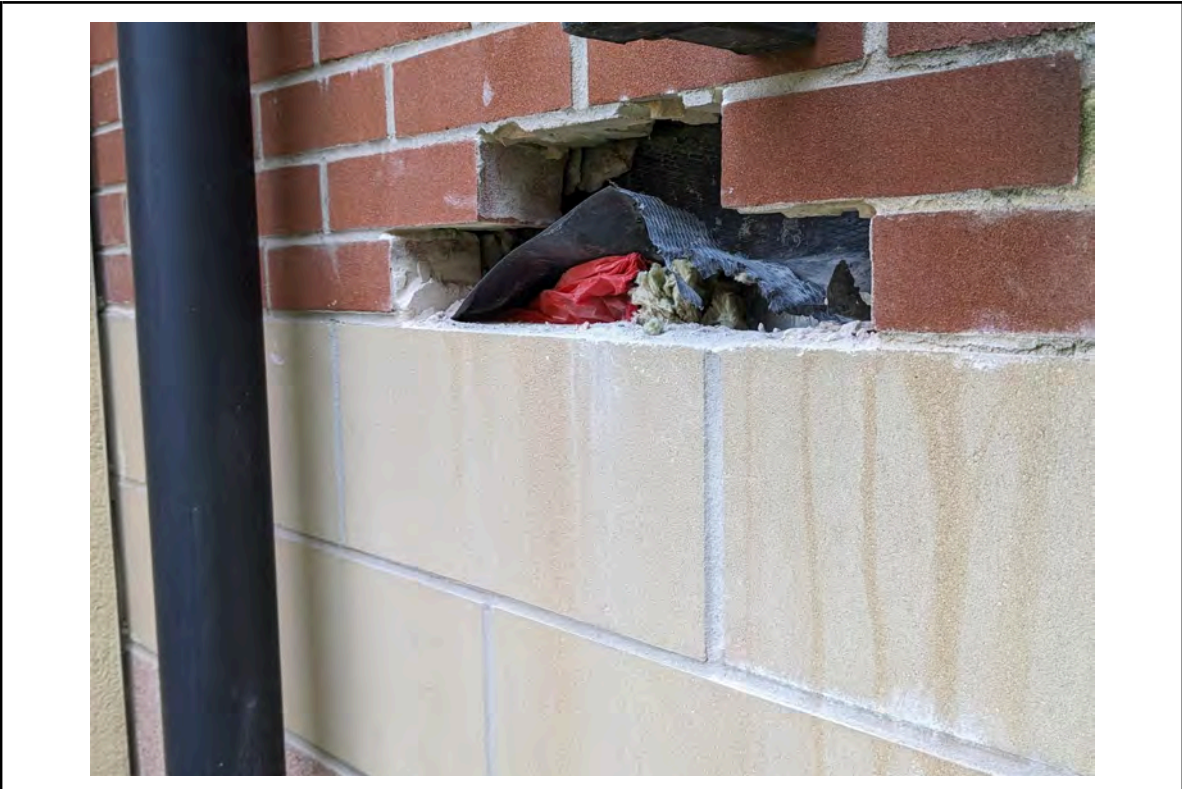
Location 19 - Brick removed on 1st floor at courtyard elevation
